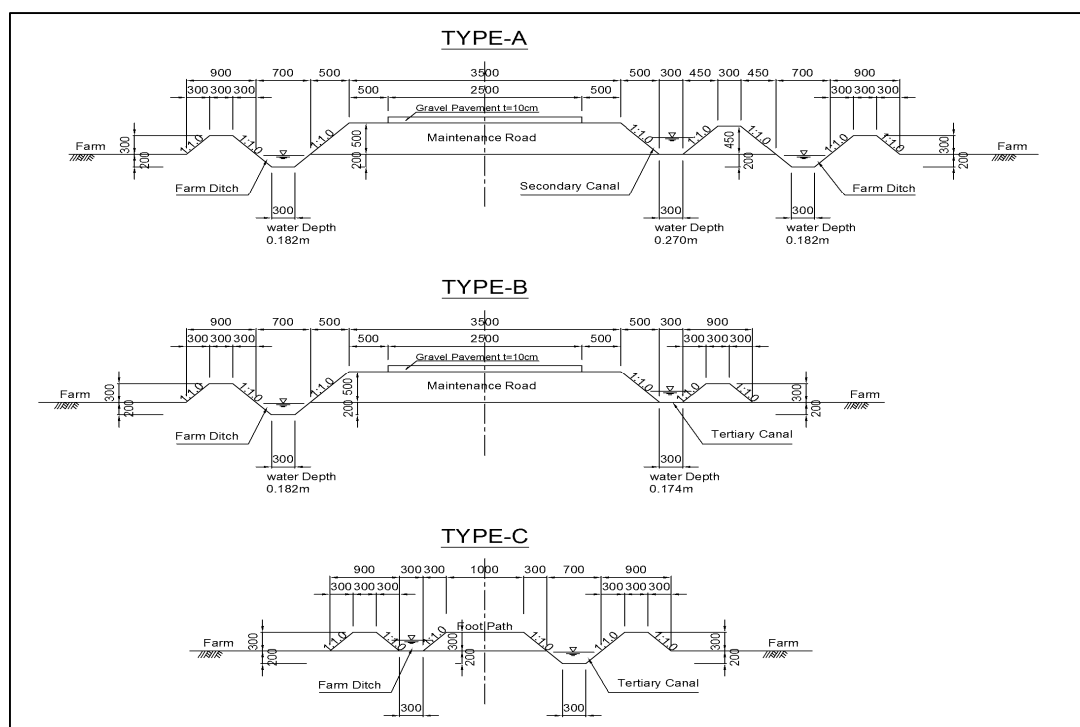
Typical Cross Section of Irrigation and Drainage Facilities in Command Area
